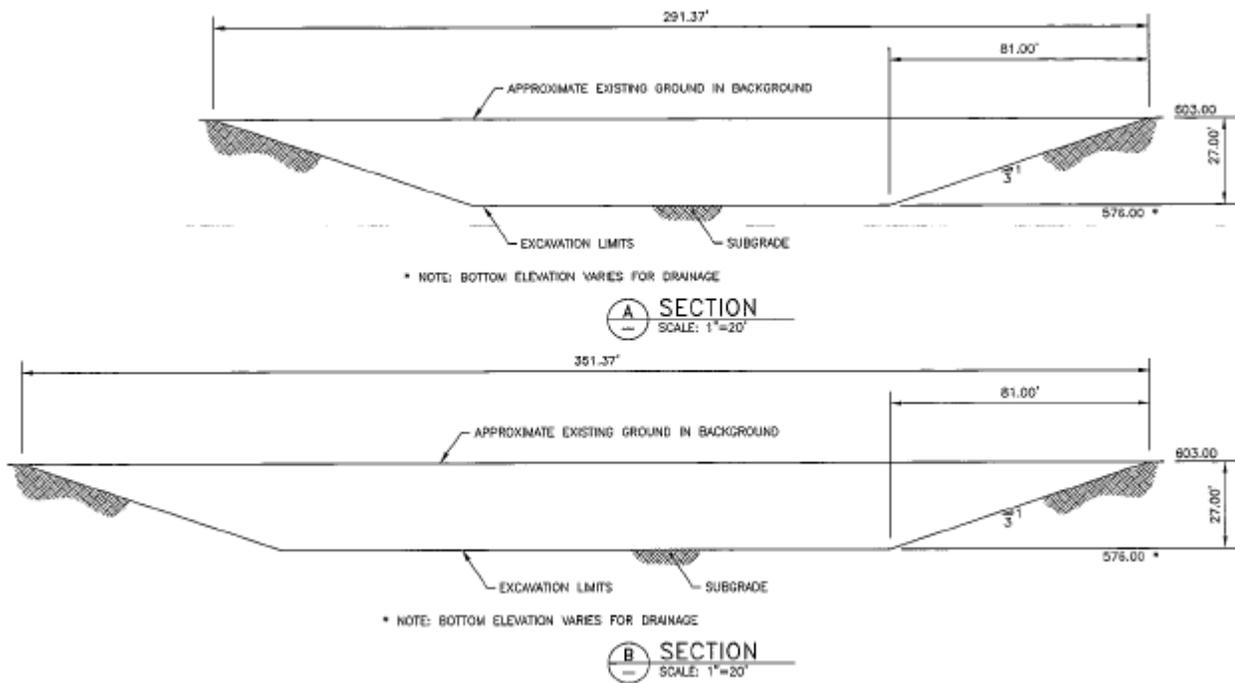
LERF Basin 41 Excavation Section Views showing Dike (H-2-838748, Sheet 1)
